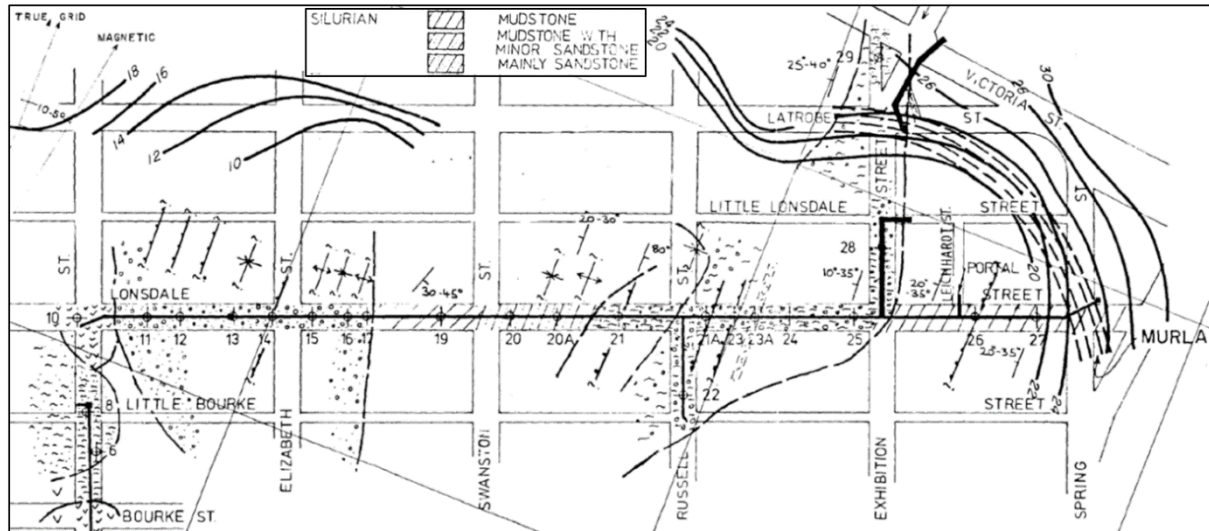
Lonsdale Street tunnel layout and geological interpretation (after, [12])
